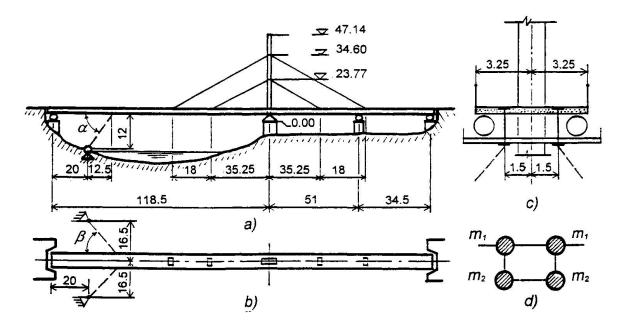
Cable-stayed pedestrian bridge in Vilnius, Lithuania. a) Elevation; b) Plan; c) Cross Section; d) Calculation model of the cross section.
